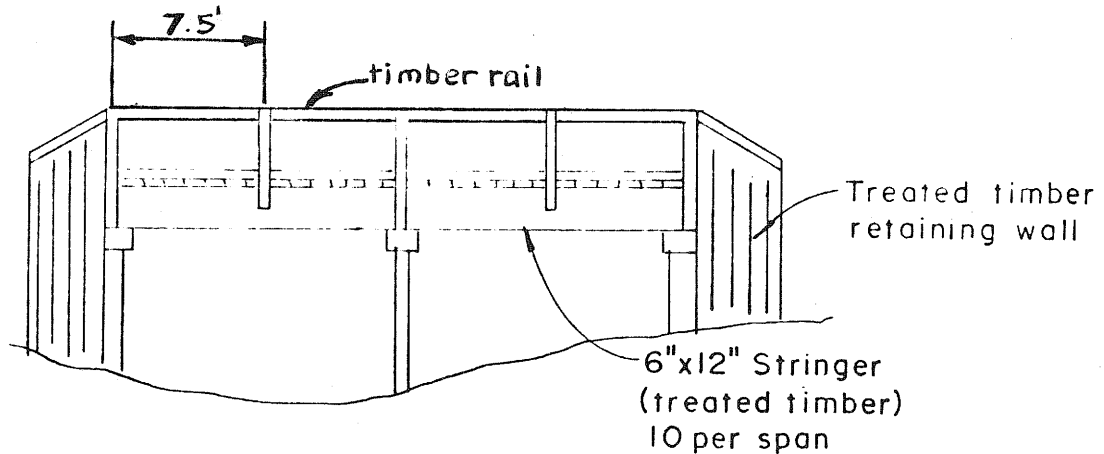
EXAMPLE BRIDGE INSPECTION DATA REPORT
